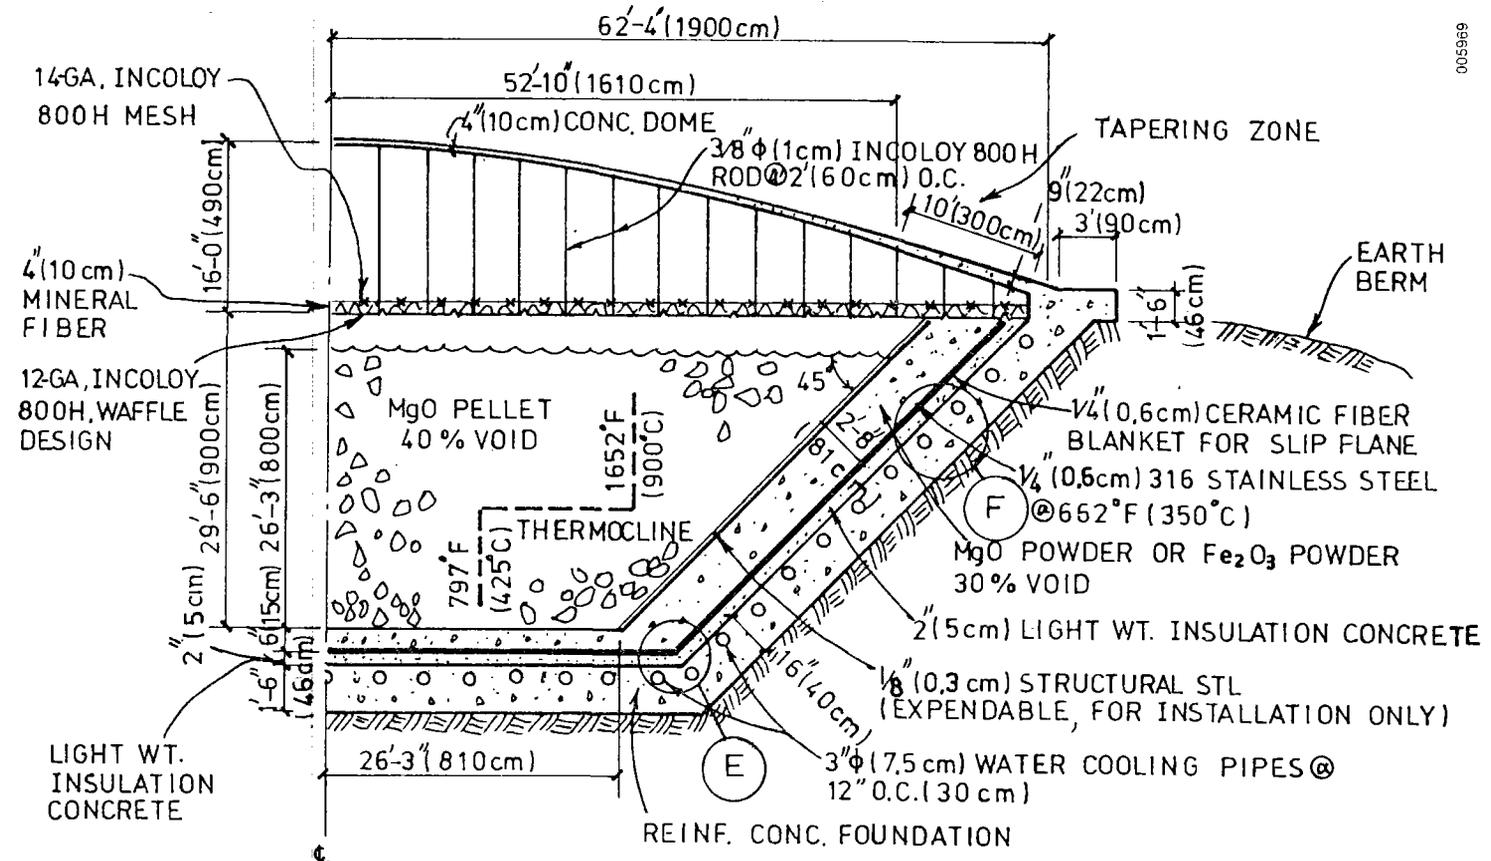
Details of Single-Tank, Two-Media, Sloped-Wall Tank (Reinforced Concrete Tank). Also refer to Figure 2-8
